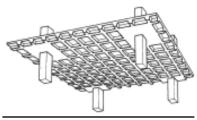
Contemporary drawing illustrating waffle slab construction.
